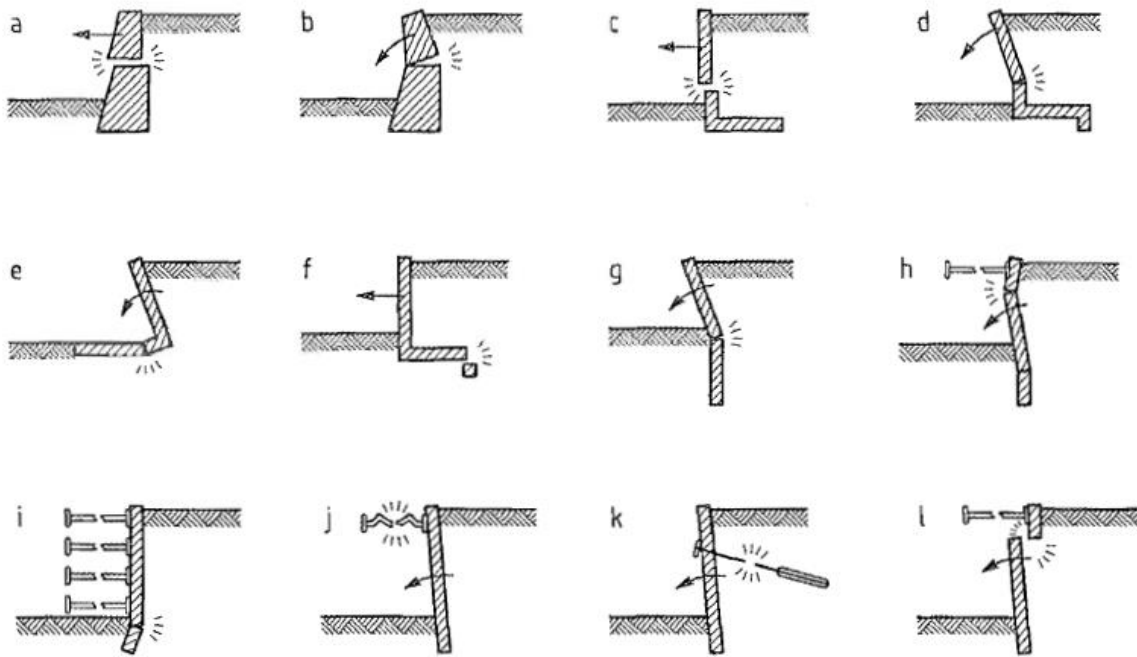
Examples of Limit Modes for Structural Failure of Retaining Structures
